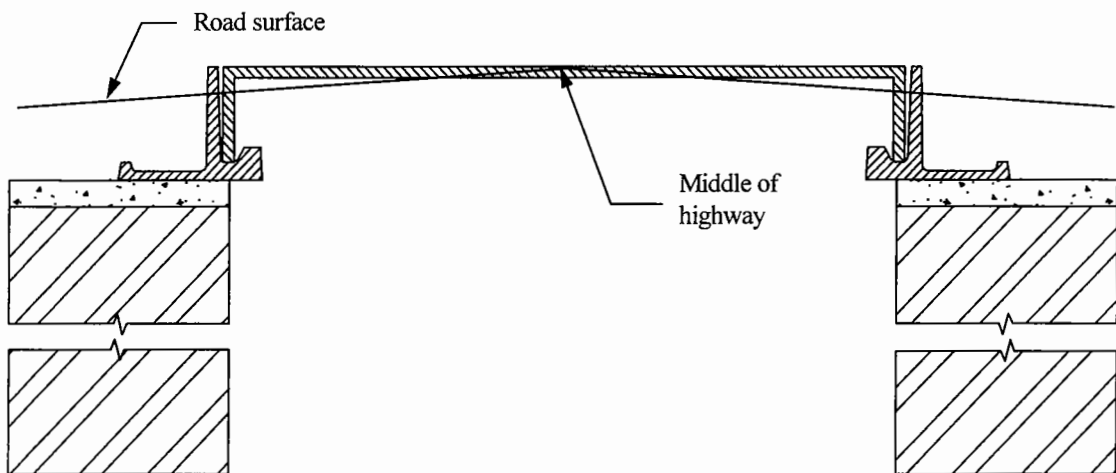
Example of where road ironwork cannot be set at the same level as the surrounding pavement
